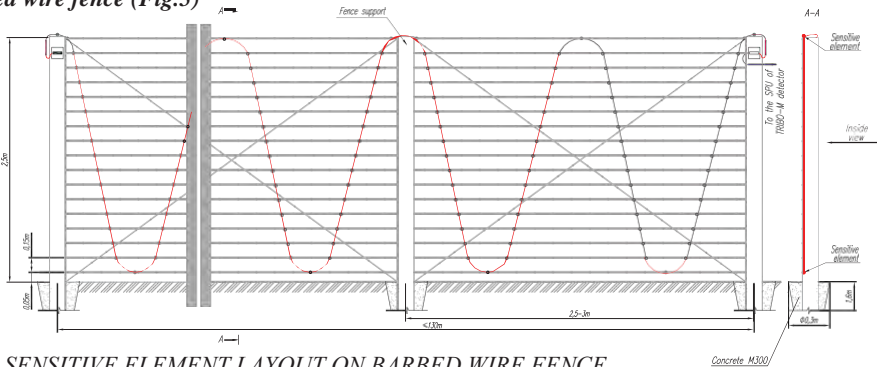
SENSITIVE ELEMENT LAYOUT ON BARBED WIRE FENCE
